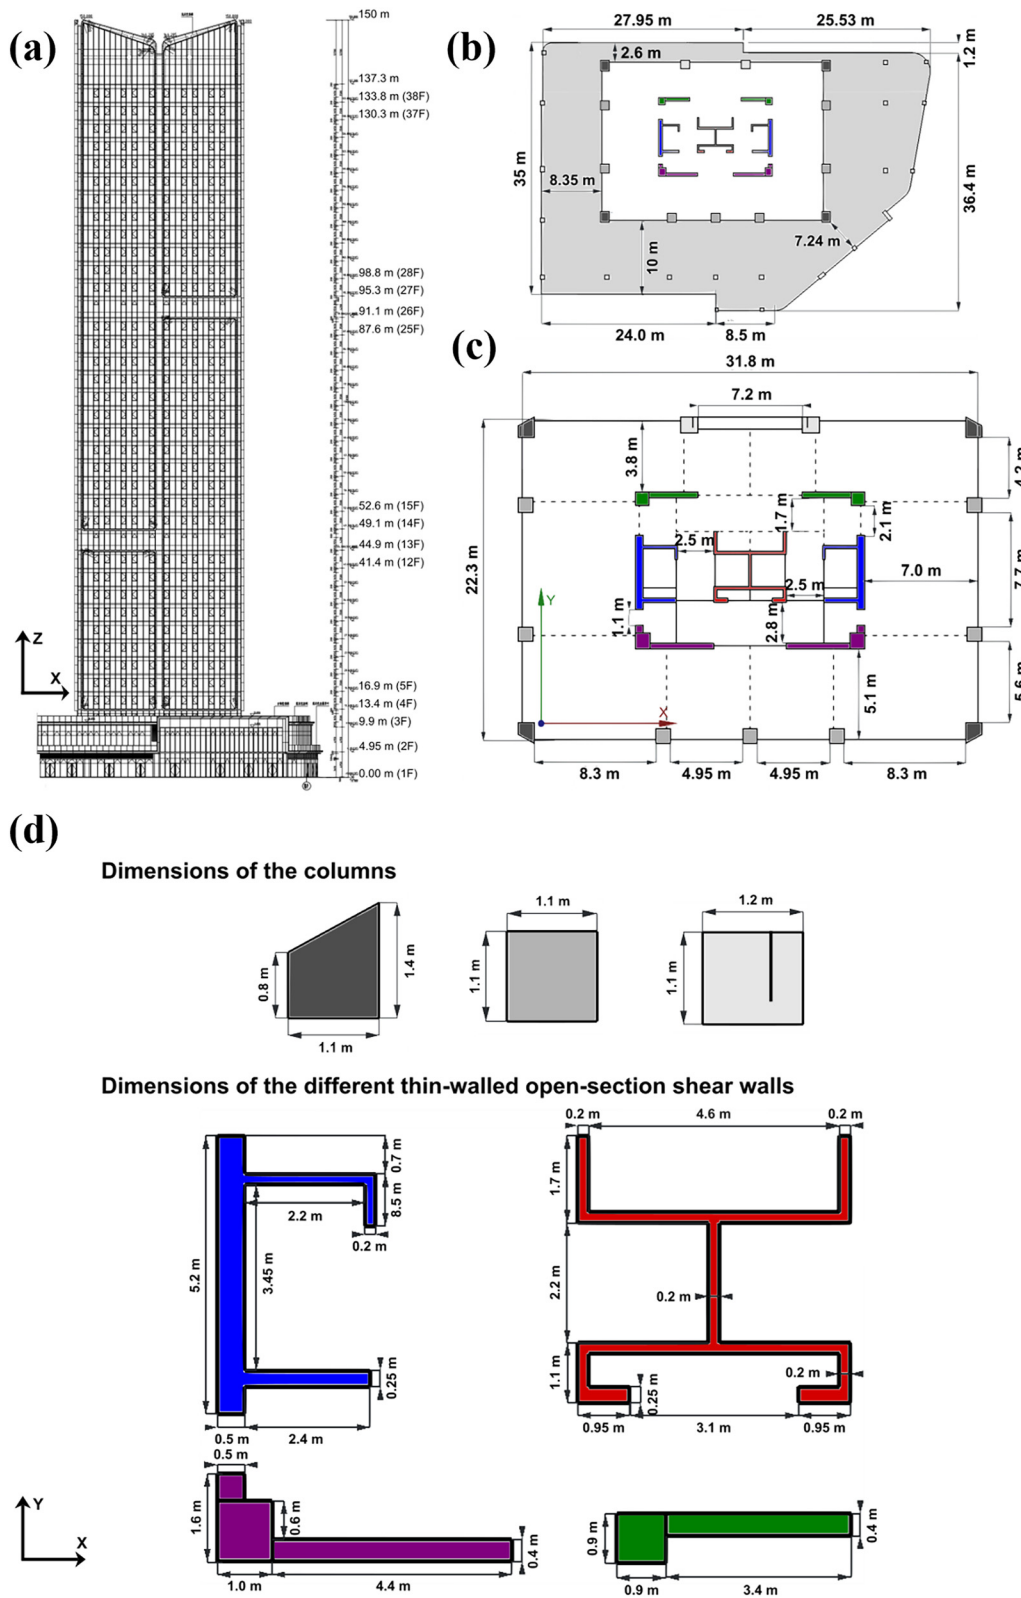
Structure description containing (a) lateral view of the K3-11 tower #1, (b) section dimensions for the 1, 2 floors, (c) section dimensions for the 3–38 floors and (d) structural components dimensions (columns and thin-walled open-section shear walls).
